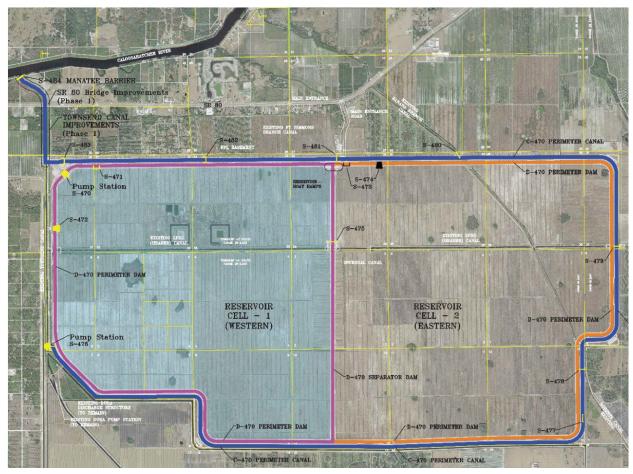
Caloosahatchee River (C-43) West Basin Storage Reservoir site plan.
